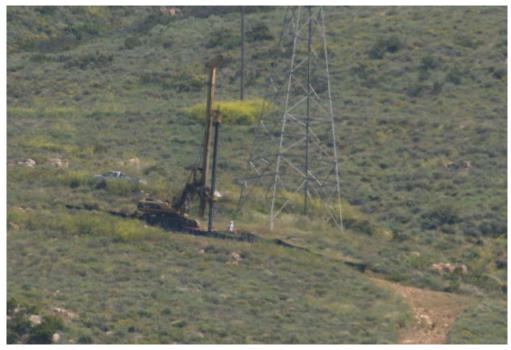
The Woodward drilling crew worked at Pole Site 30 to complete the final 138 kV foundation excavation on the project.
